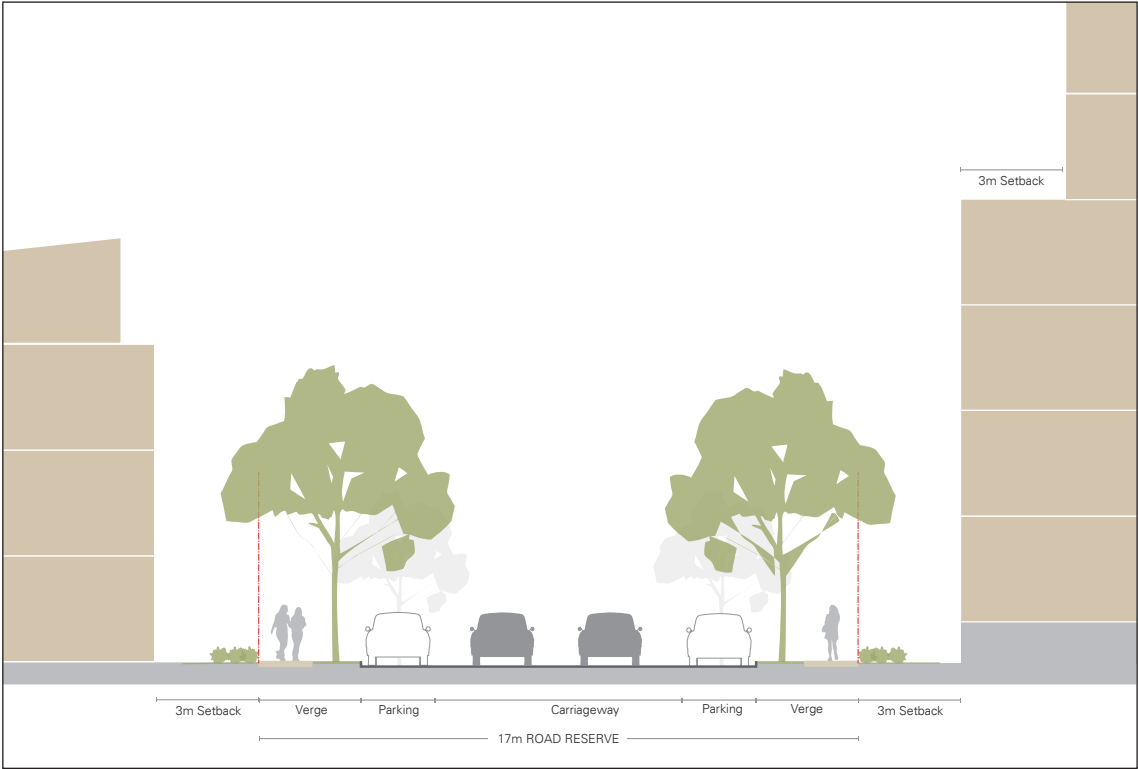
Section illustrating setbacks above 4 storeys
